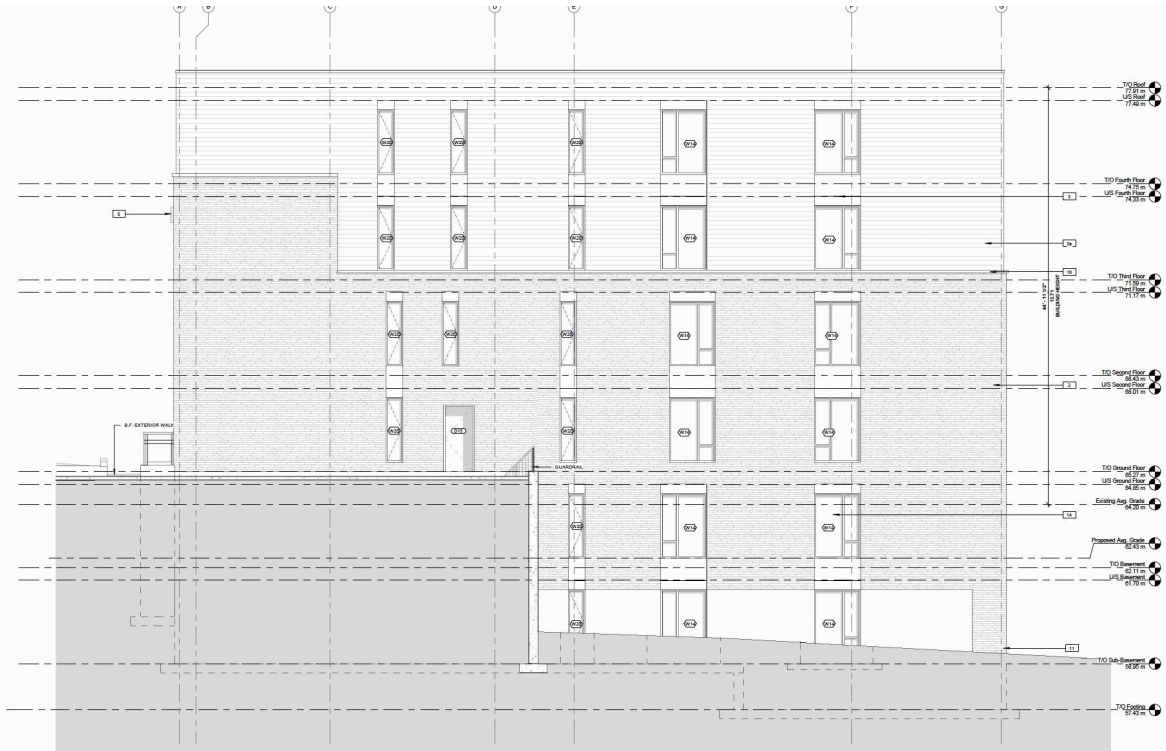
North 2D Elevations (Source: Lawrence Architects)
